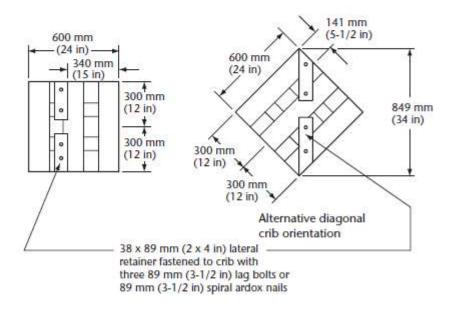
Wood-crib pier foundation (See Clauses 6.4.2, 6.4.6, and B.6.)
